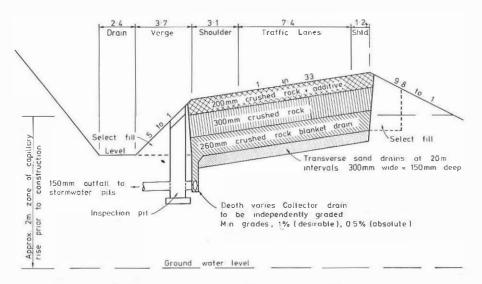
Typical crosssection in culling of the Western Freeway (Wallace to Bungaree).
